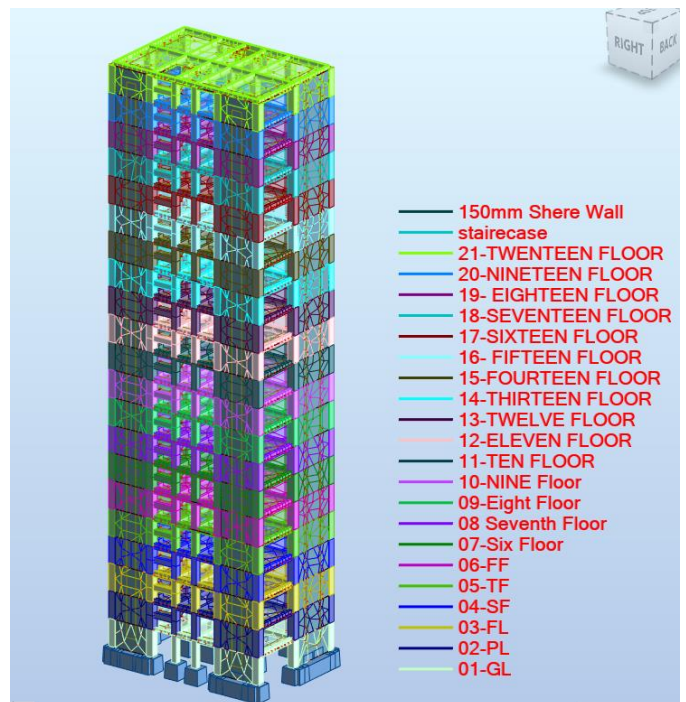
Elevation (3-DView) With Shear Wall At Robot Software
